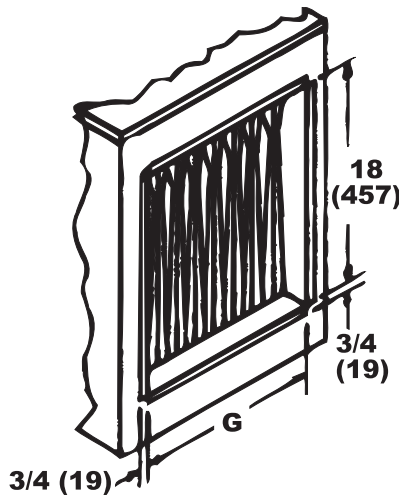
Ductwork Connection Dimensions (Refer to [Table 8](#))
